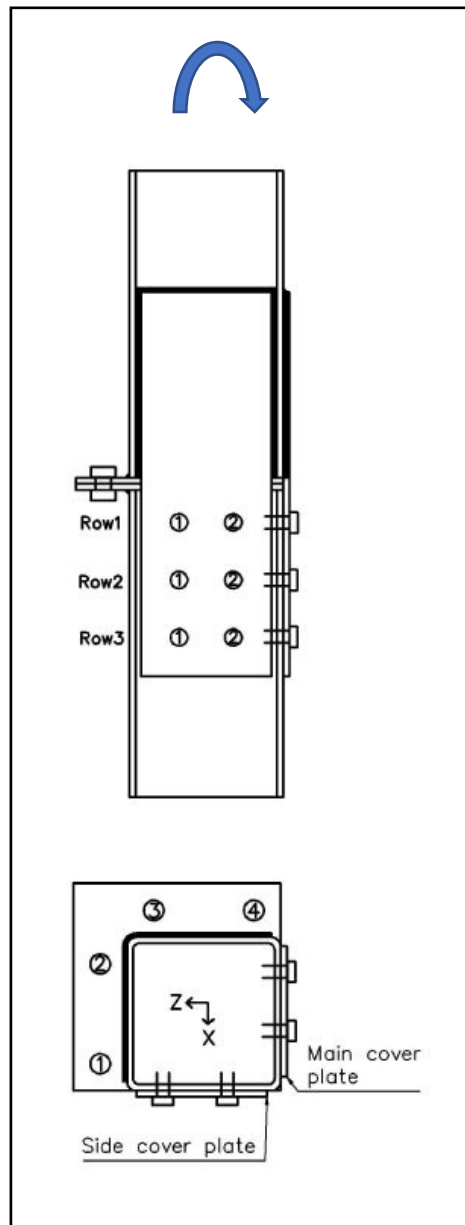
Plan and elevation of specimen CC-1 (Case 1)
